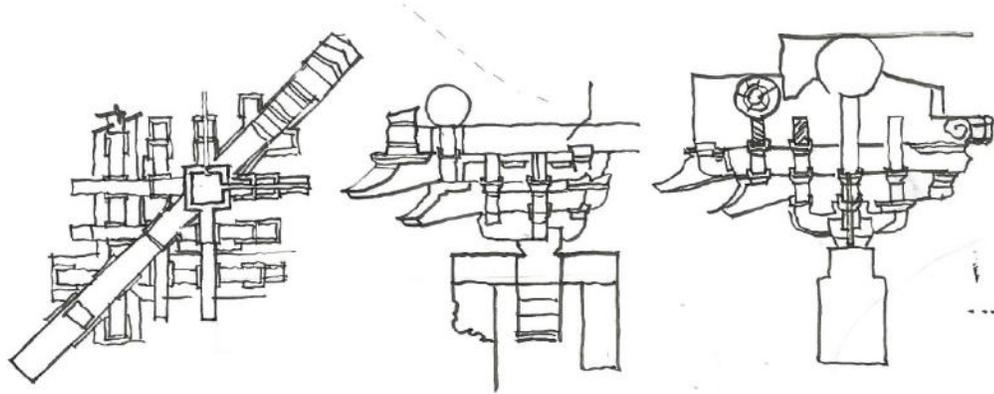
Dougong* structure, traditional wood balancing system-connecting wall and roof
